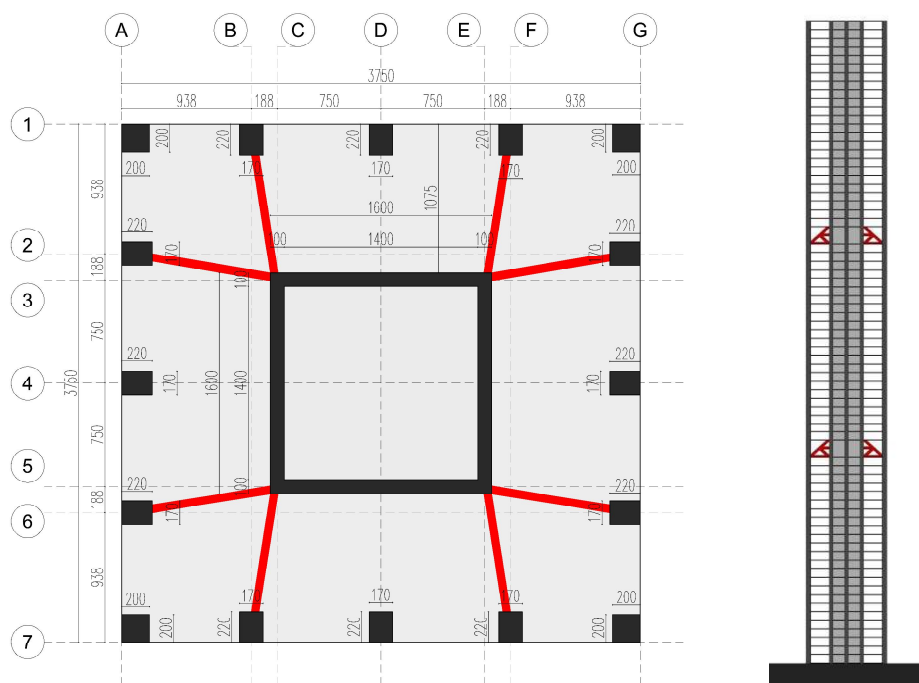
Typical floor plan and elevation of model "OF_OPT_2b" with outriggers
